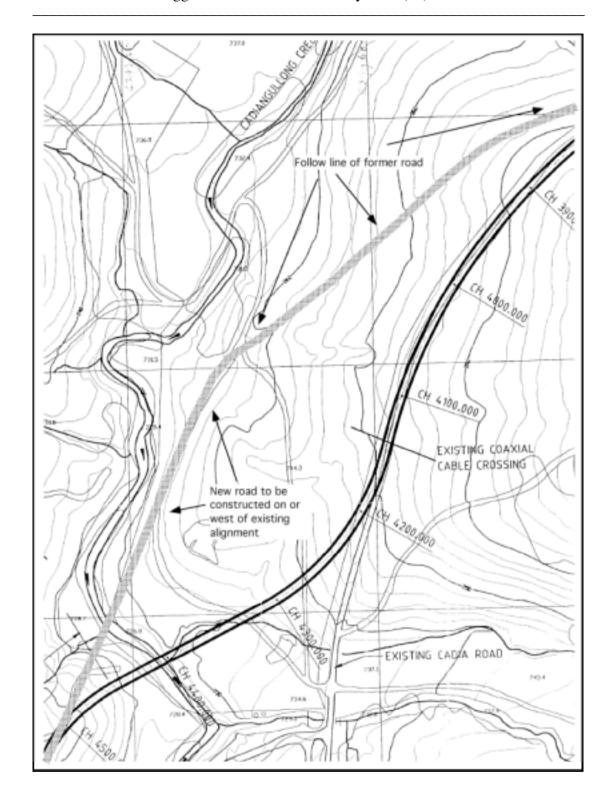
Plan showing the preferred option for the realignment of the proposed Mine Access Road around the East Cadia Village Site (Detail of Figure 1.3).
